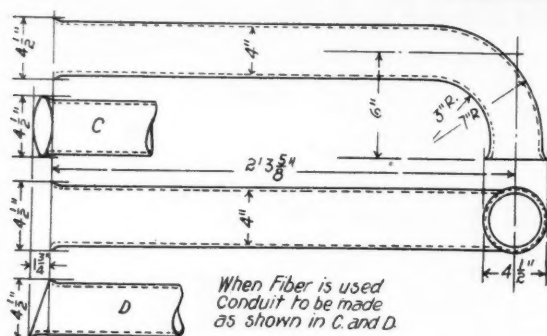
Conduit for Signal Foundation, Iron or Fibre.
